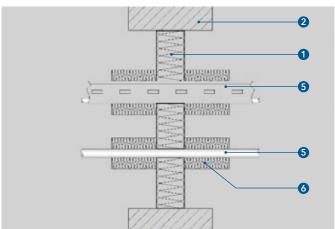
Insulated metal pipe penetrating seal in rigid wall
